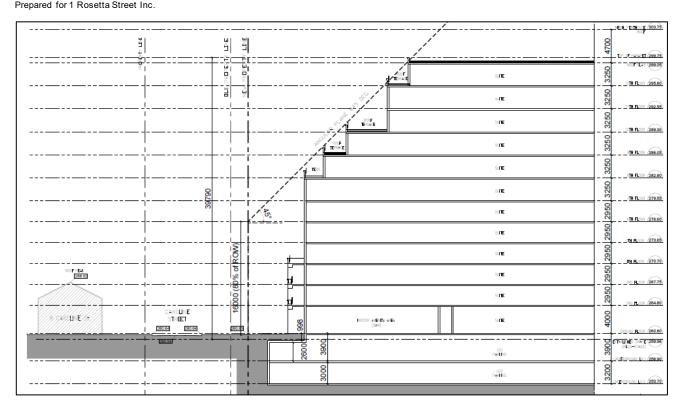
Cross -Section of Caroline Street and the Proposed Development, Prepared by ICON Architects
